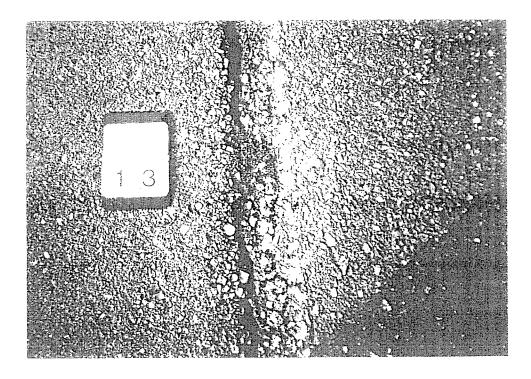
Crack of Photo 3.29 After Vacuum Blasting
